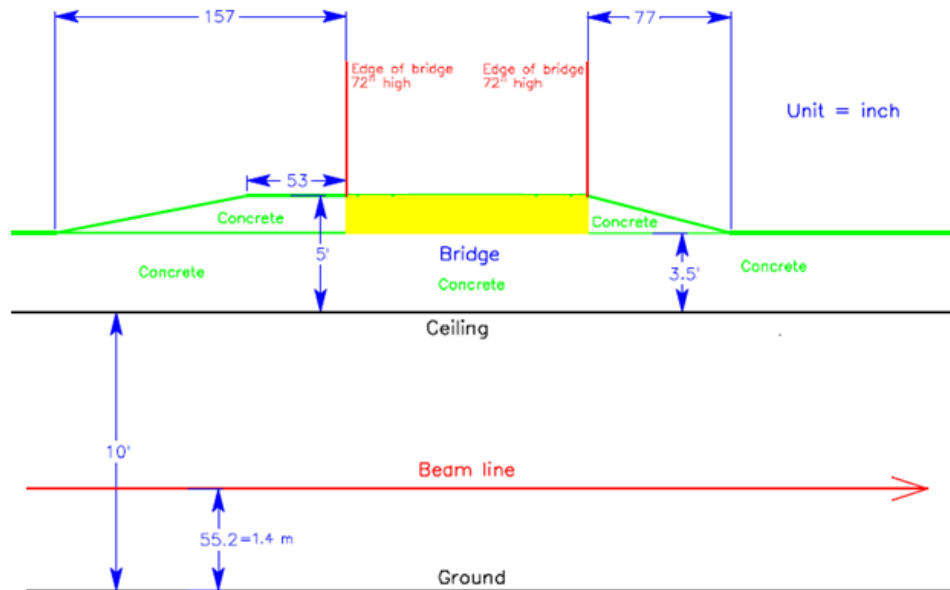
BTH2 roof shielding proposal (elevation view).
